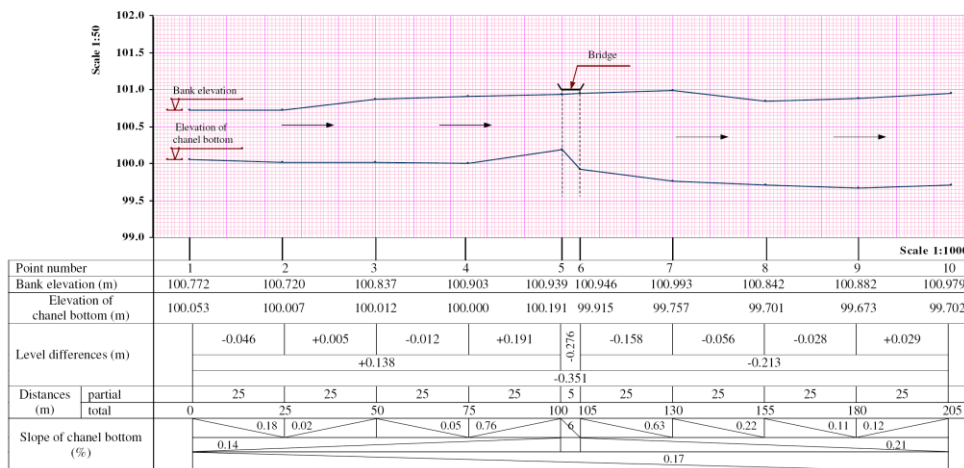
Longitudinal section CC1 channel upstream and downstream of the culvert blocked
